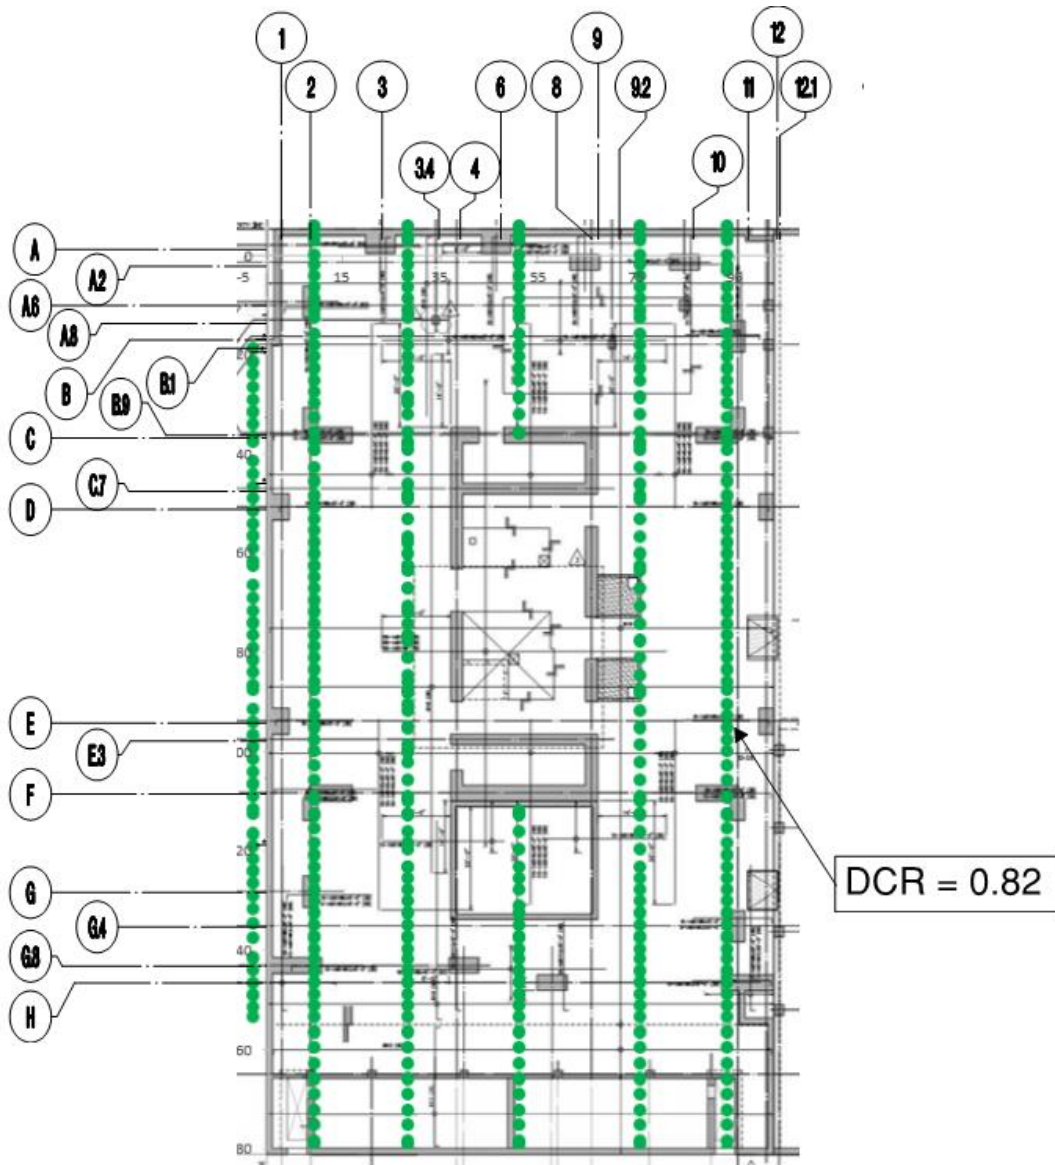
DCR Plot for North-South Bottom Reinforcement Design Strips for Gravity Load Envelope with Jacking Loads
